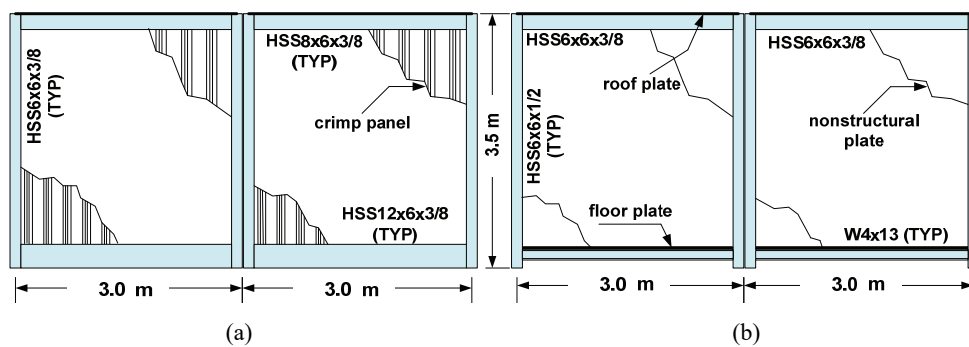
Prototype building elevation views at (a) column axes 1 and 3 (b) column axis 2
